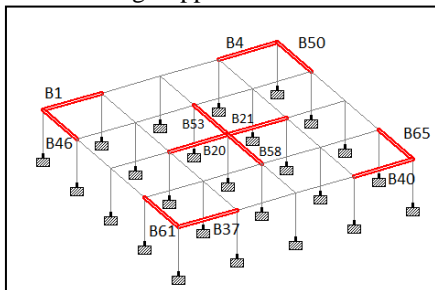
Isometric View showing Beams selected for results of diff. settlement of Ground floor, 5th floor & 9th floor
